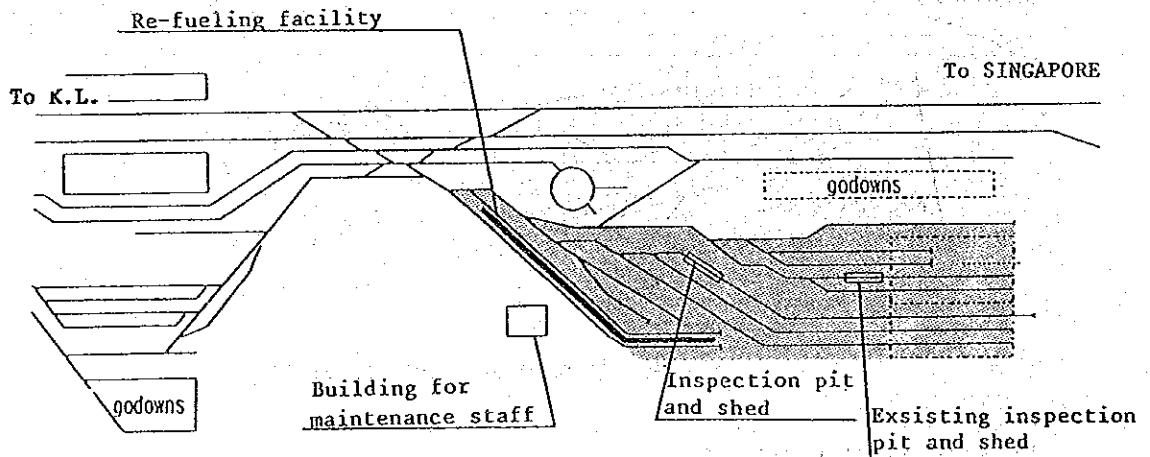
Equipment Layout of DMU Depot (2/2)
